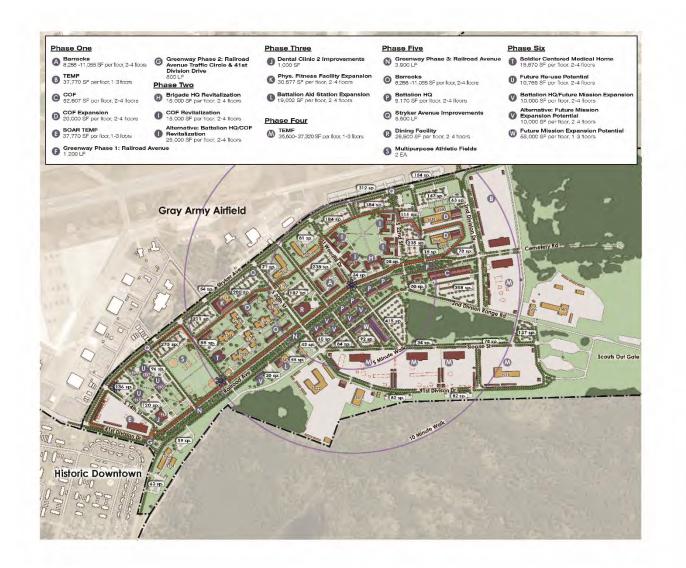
Old Madigan Area Development Plan Illustrative Plan
